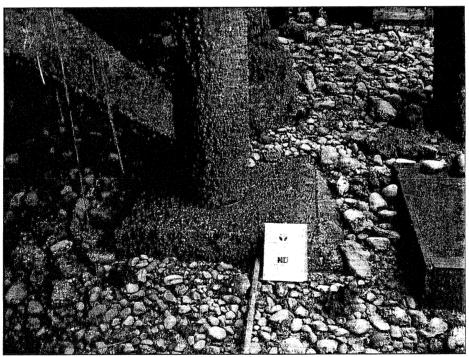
View of existing pile upon cast in place concrete footing immediately adjacent to the subject property. Note that barnacles have colonized and have higher densities than adjacent cobbles.
